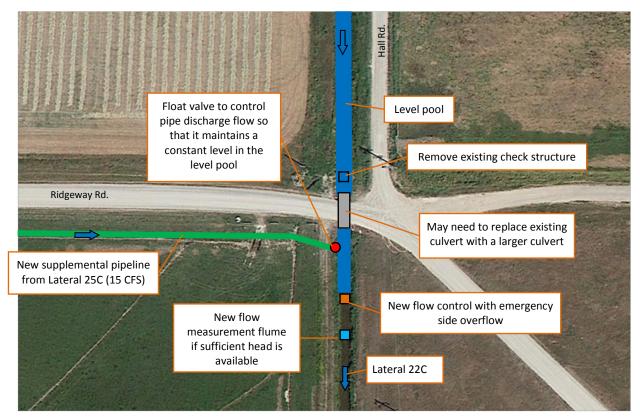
Aerial image showing the new flow control on Lateral 22C at Hall and Ridgway Road
